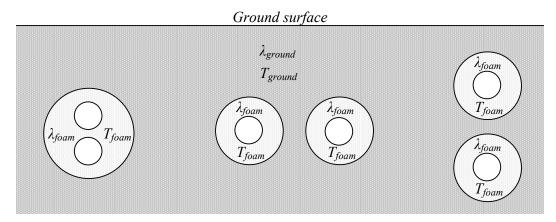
Examples of district heating pipe constructions. Twin pipe construction (left) and two types of single pipe constructions (middle and right).
